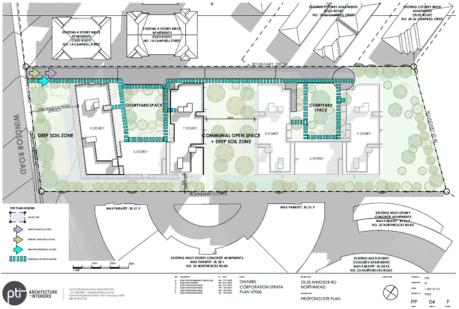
Site Reference Plan, 23-25 Windsor Road Northmead (Source: PTI Architecture)
